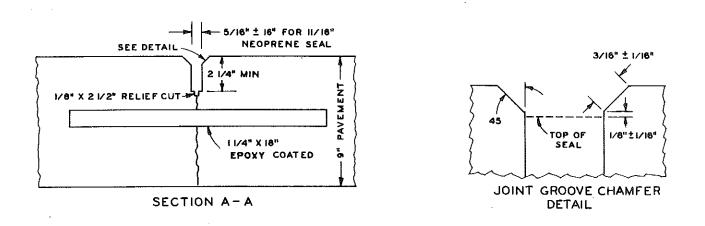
Type C, short slab, plain concrete, 90-degree joints, variable spacing, with load transfer and neoprene seals.
